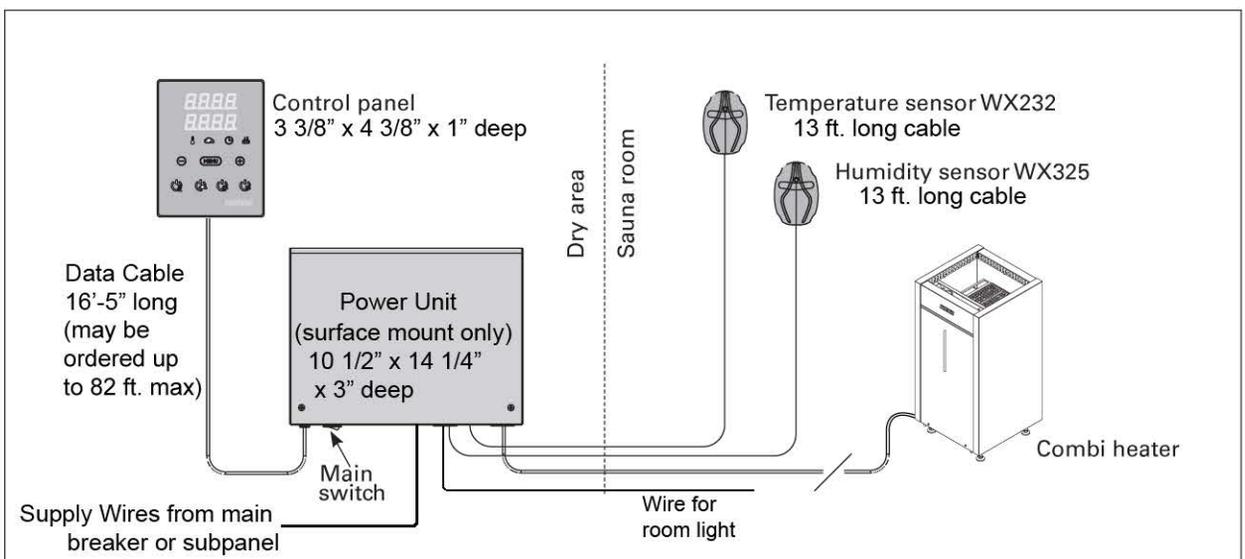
System components Electrical wires to hook up power unit, sauna heater, and room light not provided.
